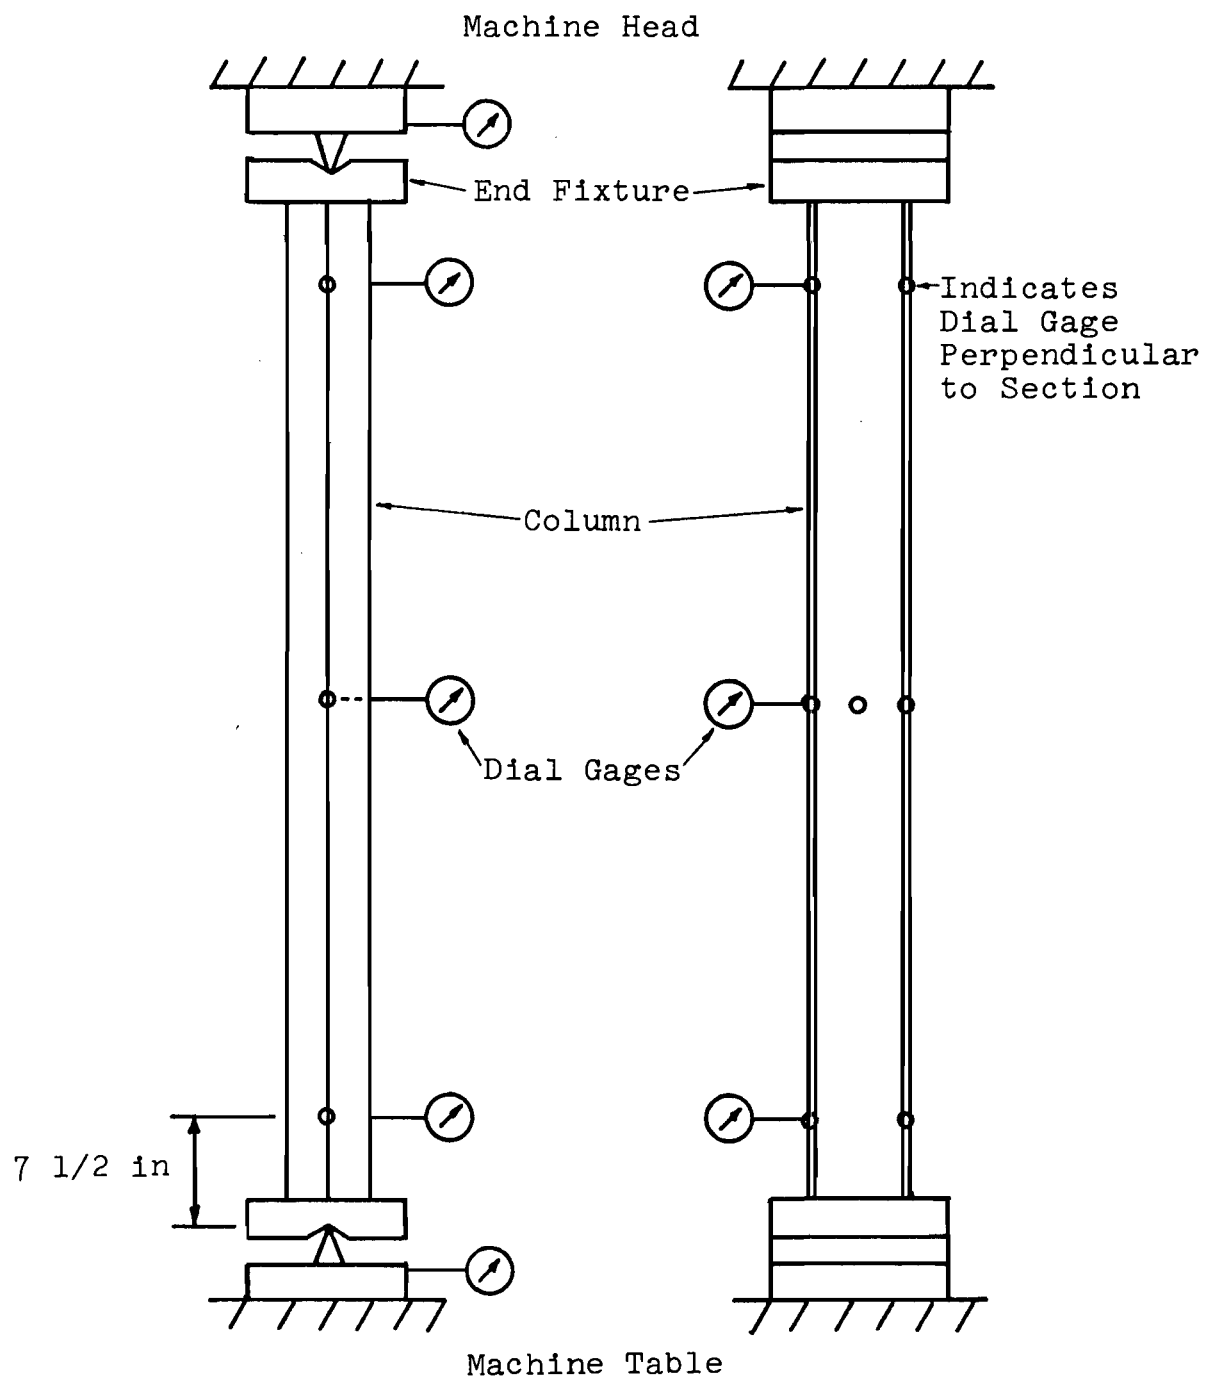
LOCATION OF DIAL GAGES FOR THE UNSTIFFENED SECTIONS U
